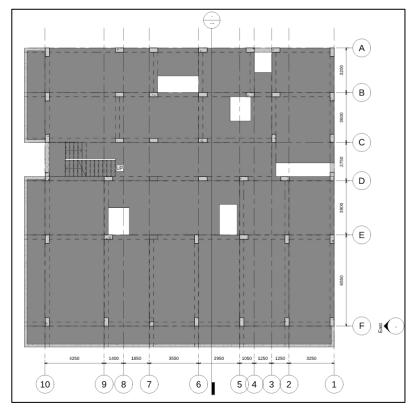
Structural Drawing For Level 1 and 2 (First and Second Floor)
